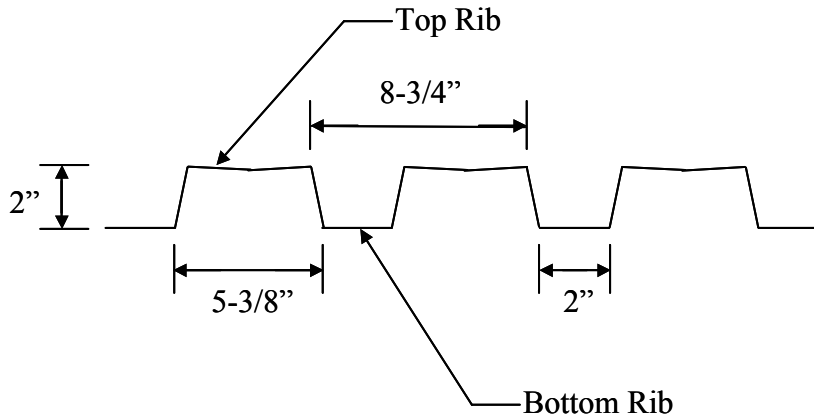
Cross Section of Stay-in-Place Steel Form
